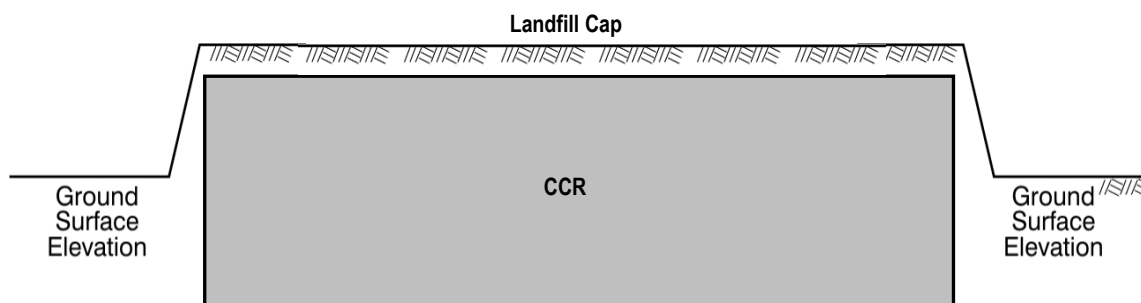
Cross-section view of closed landfill constructed above grade.
